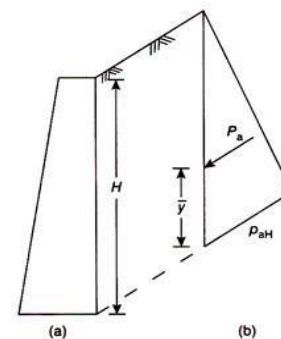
(a) Retaining wall with a sloping backfill and (b) active earth pressure diagram.
